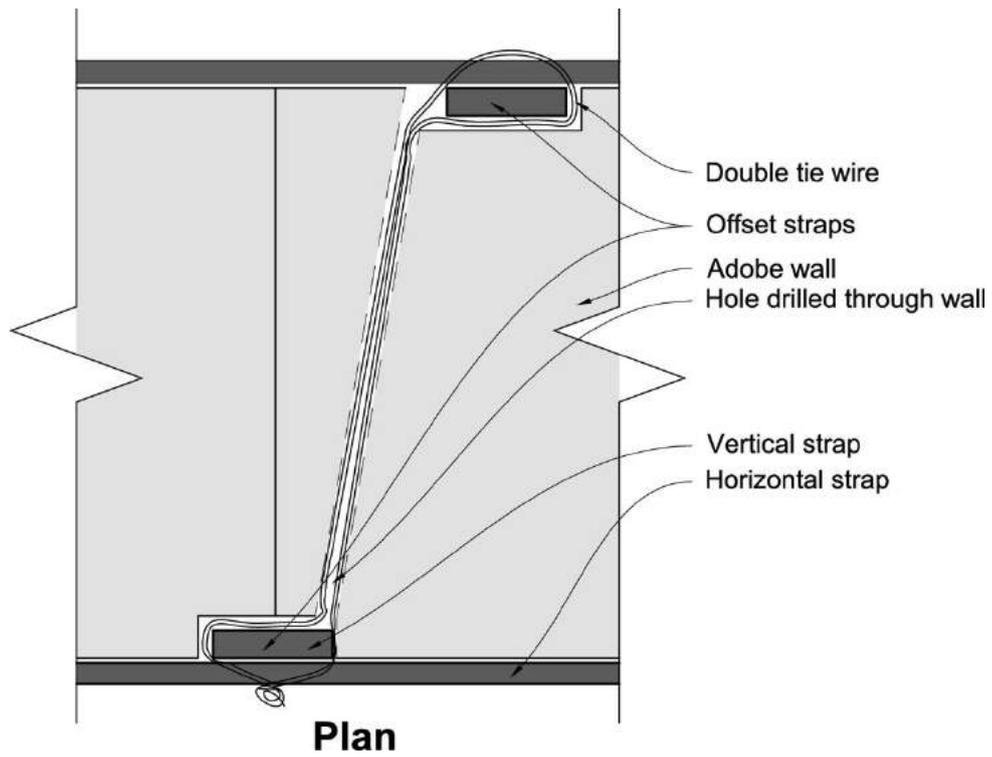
Horizontal hole and tie wire connecting two junctions of horizontal and vertical straps.
